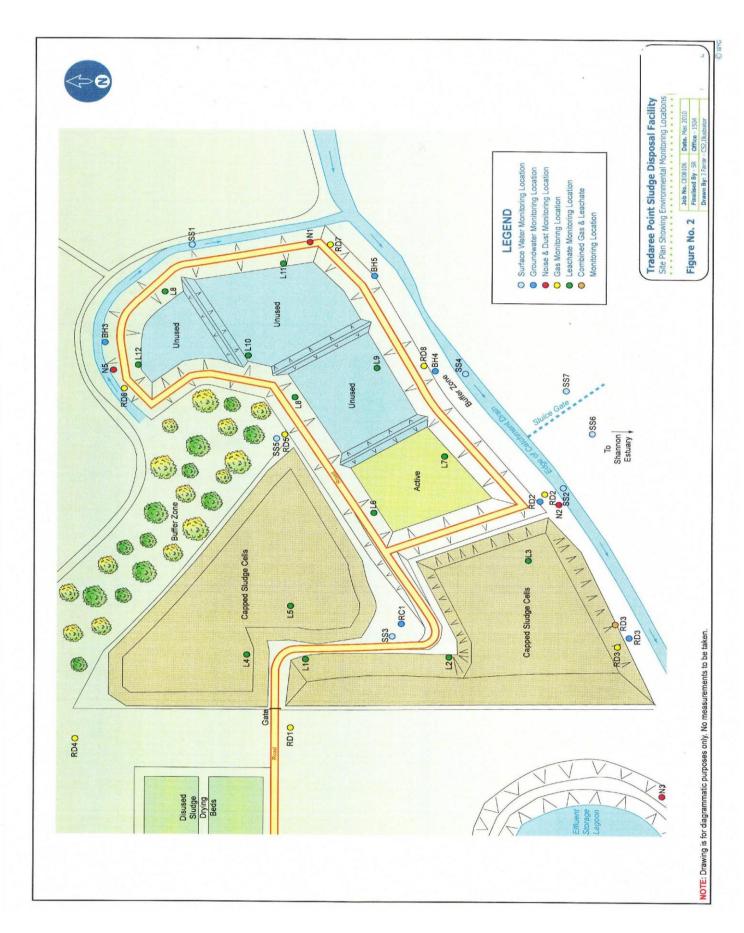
SITE PLAN SHOWING ENVIRONMENTAL MONITORING LOCATIONS
